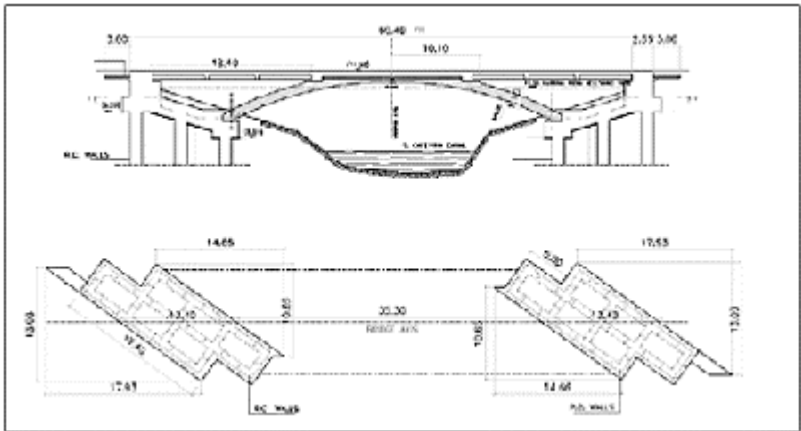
Longitudinal section and plan of the foundations of the bridge.
